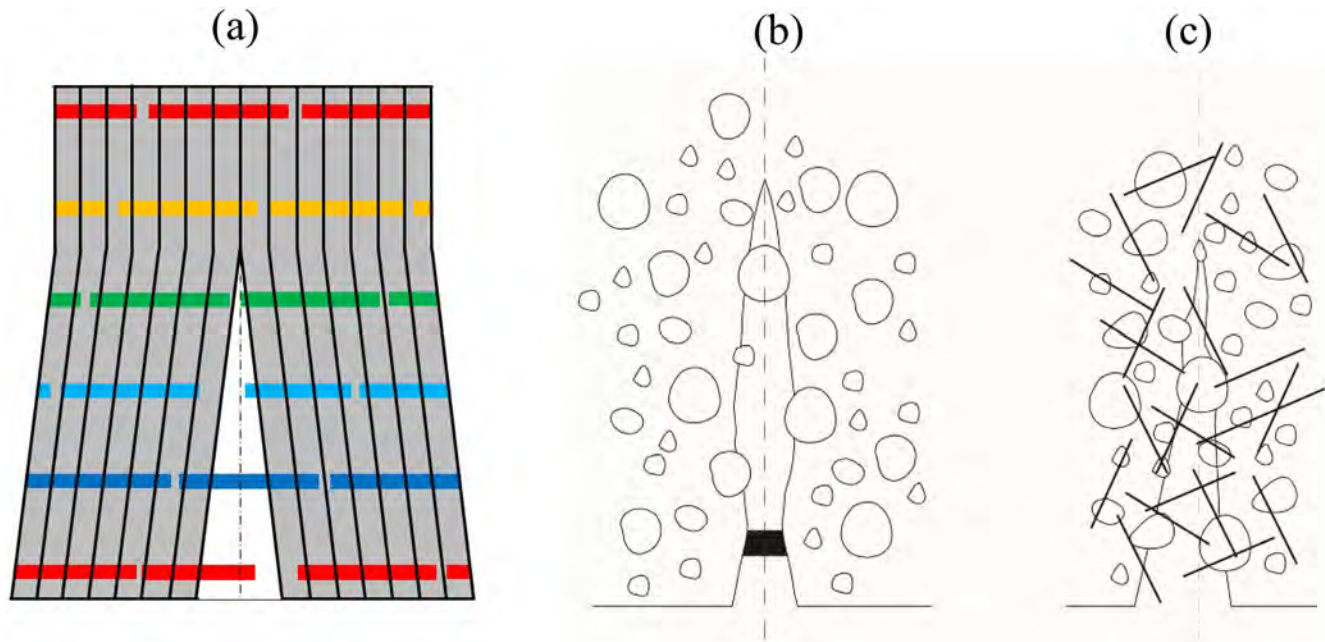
The bridging effect of reinforcement in concrete beams: (a) steel pins in the proposed reinforced 3D concrete printing; (b) traditional steel rebar in reinforced concrete; (c) steel fibers in fiber-reinforced concrete.
